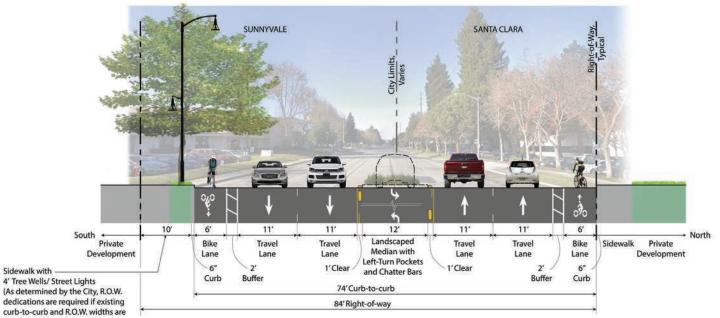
Santa Vittoria Terrace, Typical Cross Section
